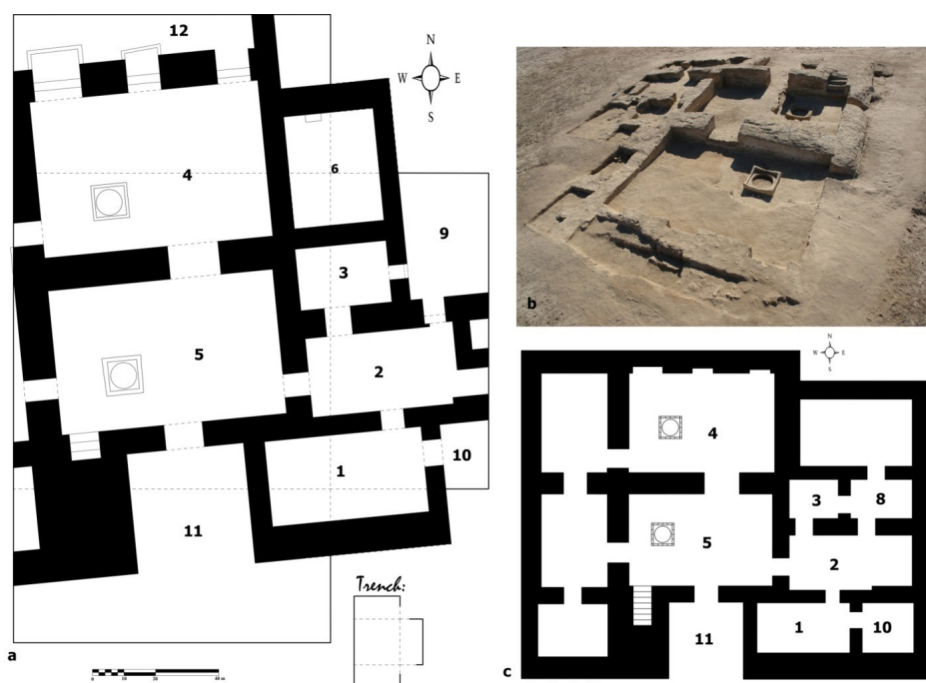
Left: plan of Building 20; Right: photo of the northern side and plan of Building no. 20
